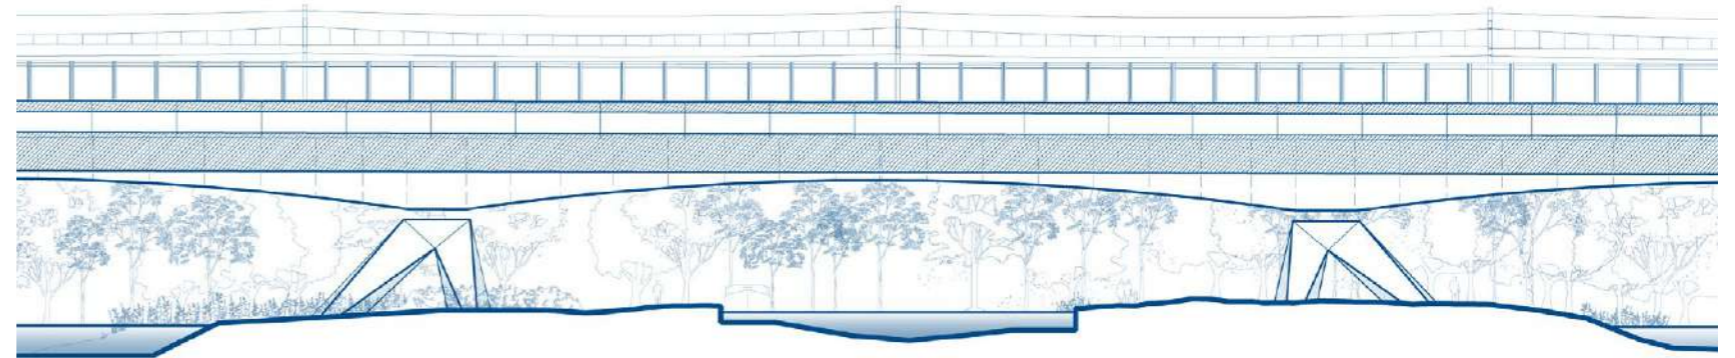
\_ Proposed elevation - Typical 4m hybrid barrier over Grand Union Canal
